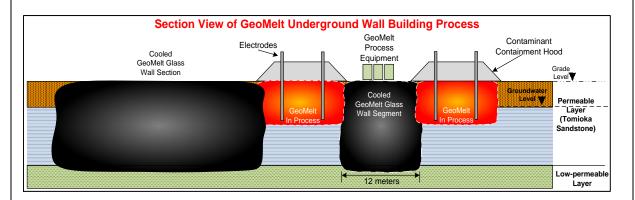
Section view of Proposed GeoMelt Underground Wall Building Process
